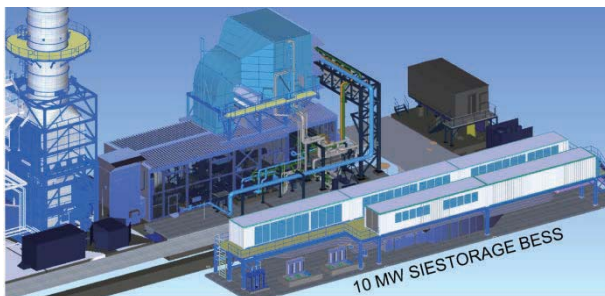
Plant Layout - SGT-800 with 10MWh Battery
